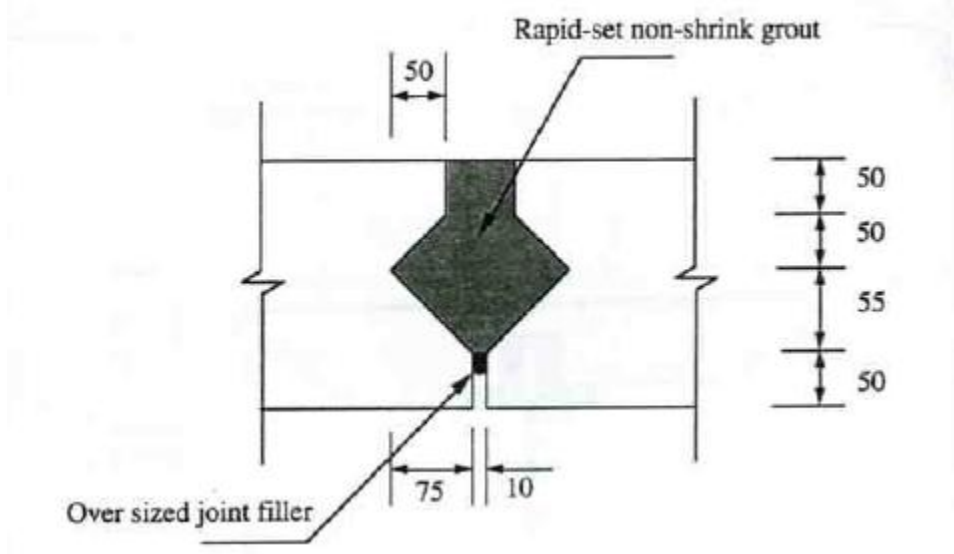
Typical geometry of a shear key used in a Full-Depth Precast Prestressed Panel System (dimensions are in mm) (Yamane et al., 1998)
